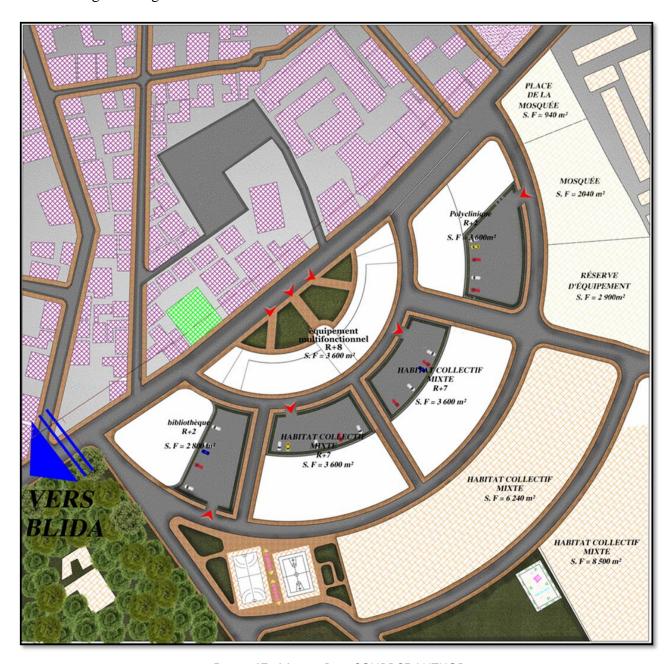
MASTER PLAN SOURRCE AUTHOR
